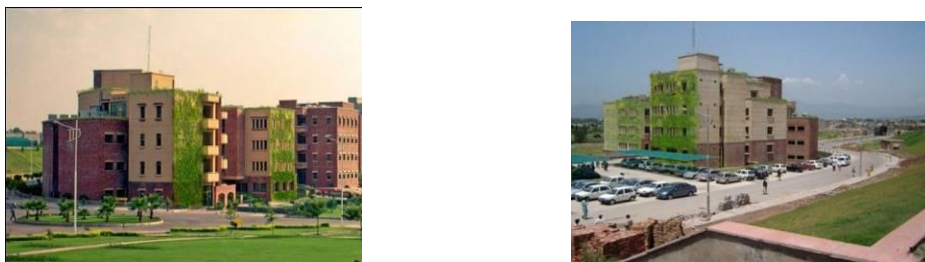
View of North Western Green Façades of Academic Block -1 (on left) and South Western Green Façade (on right) at CIIT Islamabad with application of proposed Green Vertical System.
